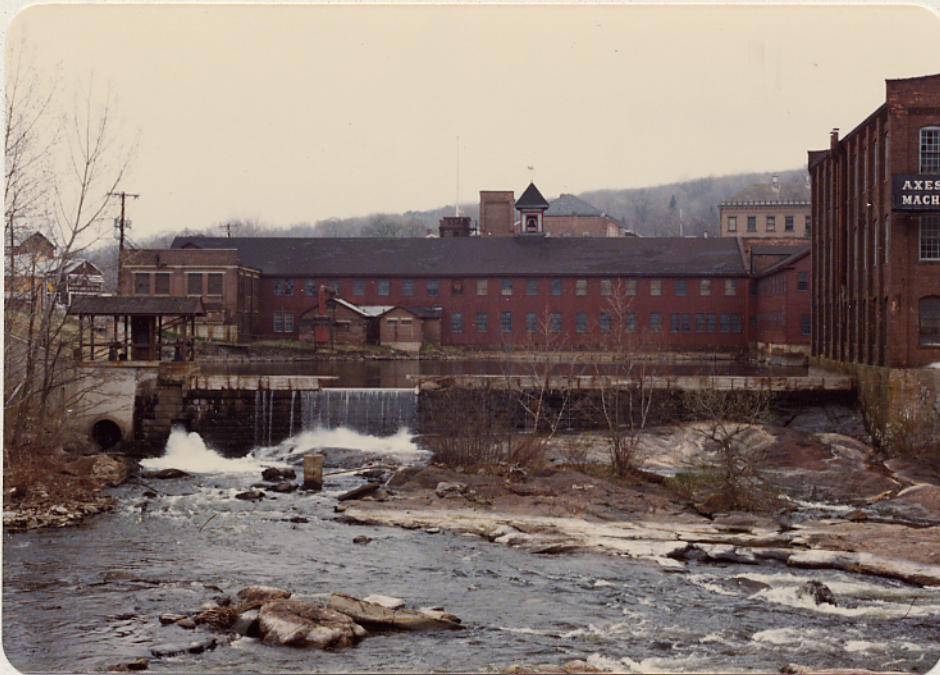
General view of masonry dam for mill forebay. Note section of broken flashboards and low level outlets. Route 179 is at left (April, 1979).
